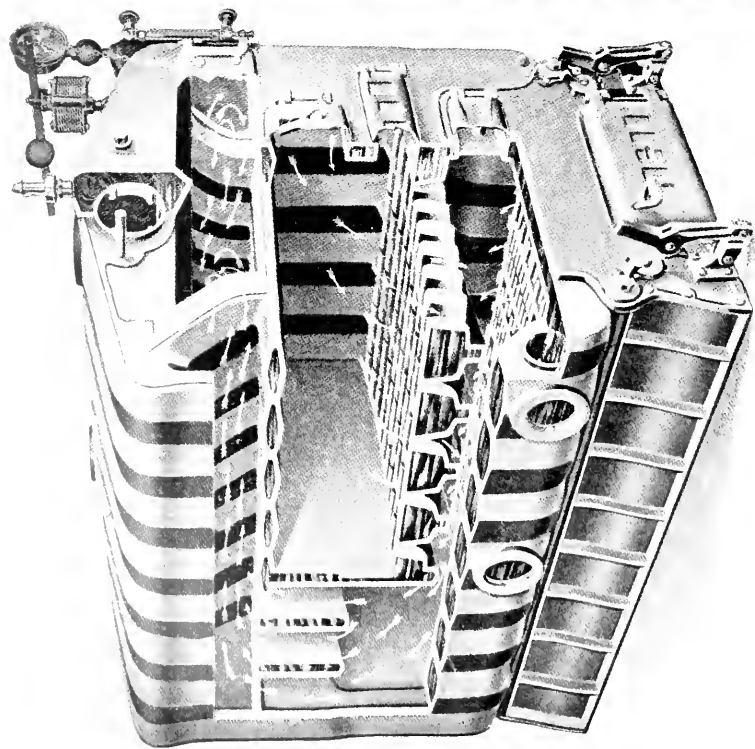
CAST-IRON LOW-PRESSURE HEATING BOILER,
